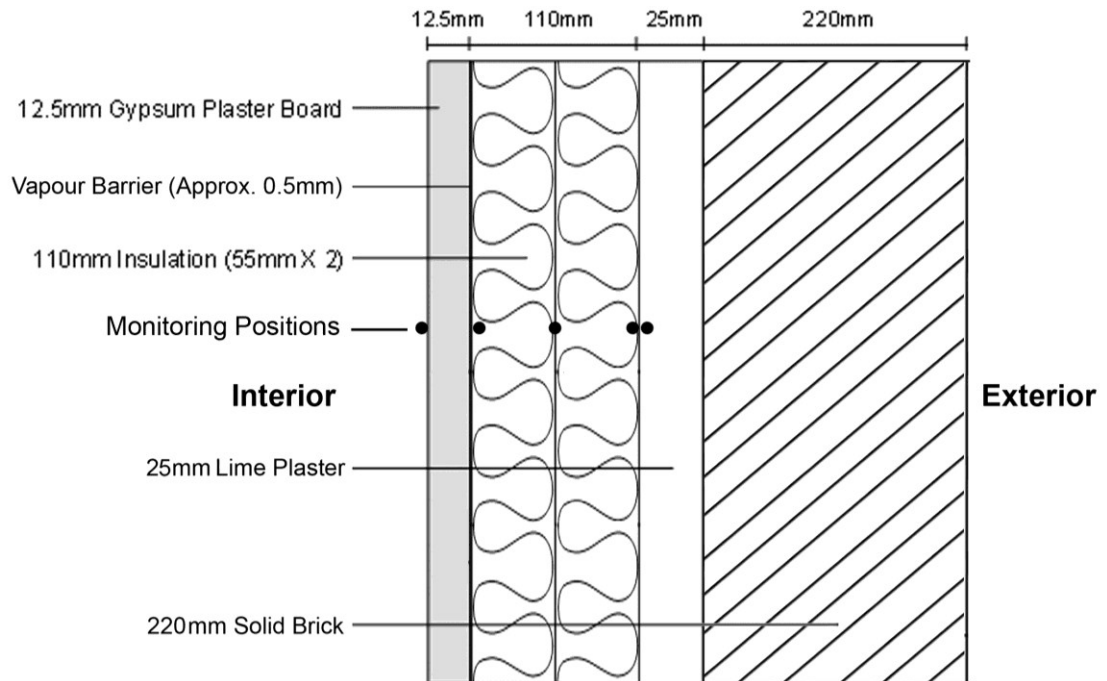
The vertical cross section of the solid brick wall assembly (with lime plaster) with vapour barrier (wall-8).
